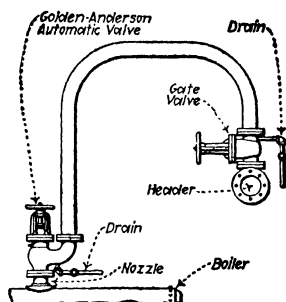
Boiler steam-outlet pipe in form of U-bend.
